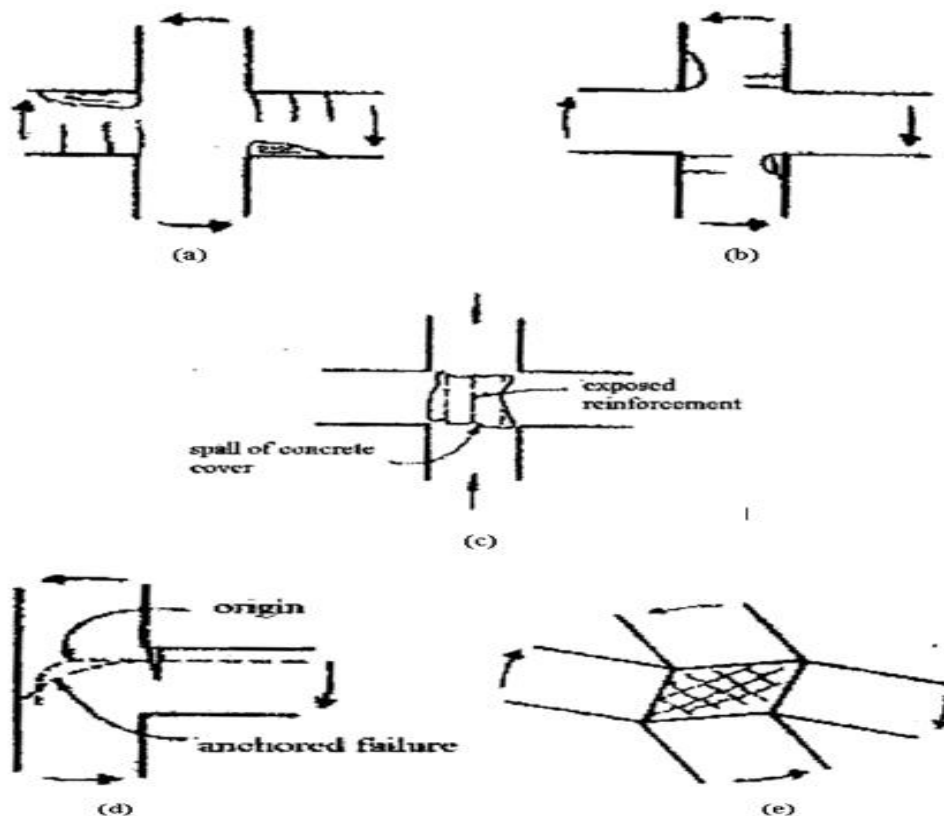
Types of failure mode in connection zone (a) Beam hinging failure, (b) Column hinging failure, (c) Failure by spall of concrete cover, (d) Anchorage failure, (e) Joint shear failure [12]
